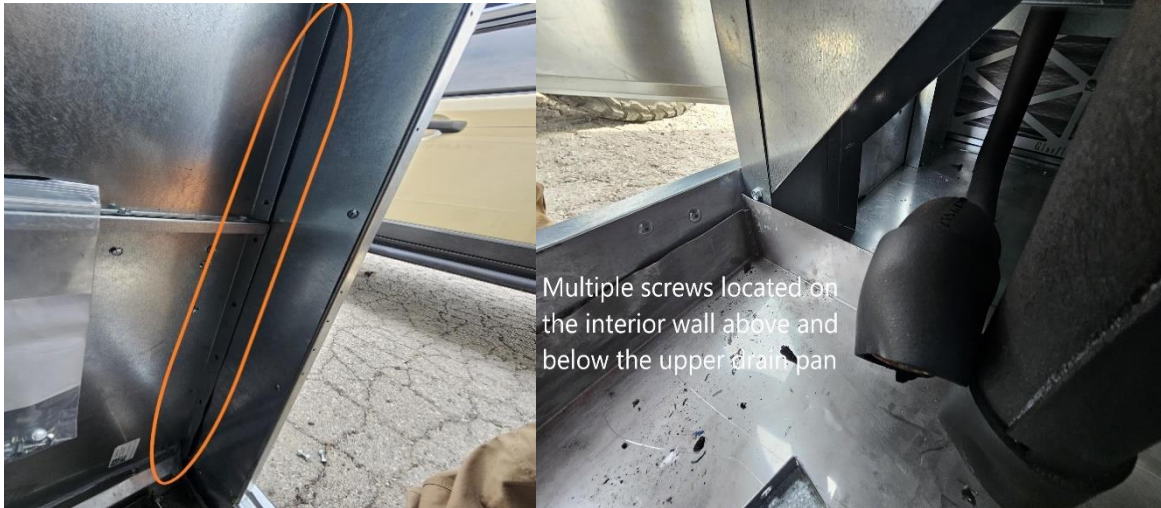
Screw Removal Coil Cabinet Bottom Panel
